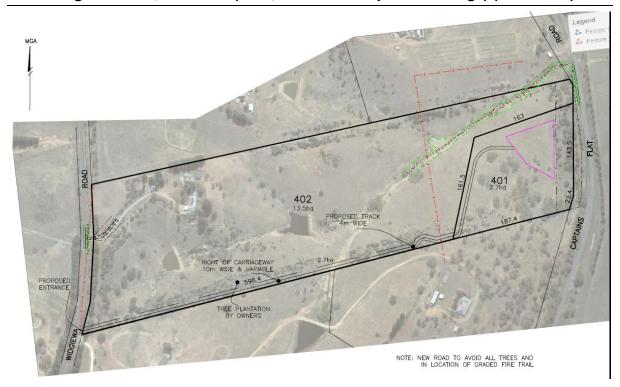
Proposed lot configuration showing new access along southern boundary off Widgiewa Road.
